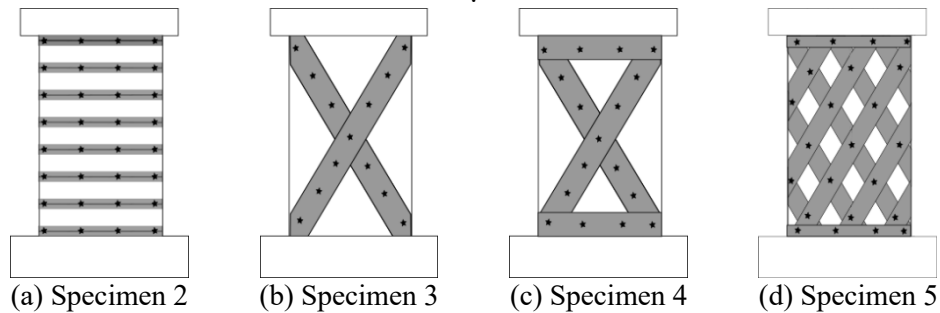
FRP strengthening configurations of test wall specimens (adapted from Altin et al. (2013))
